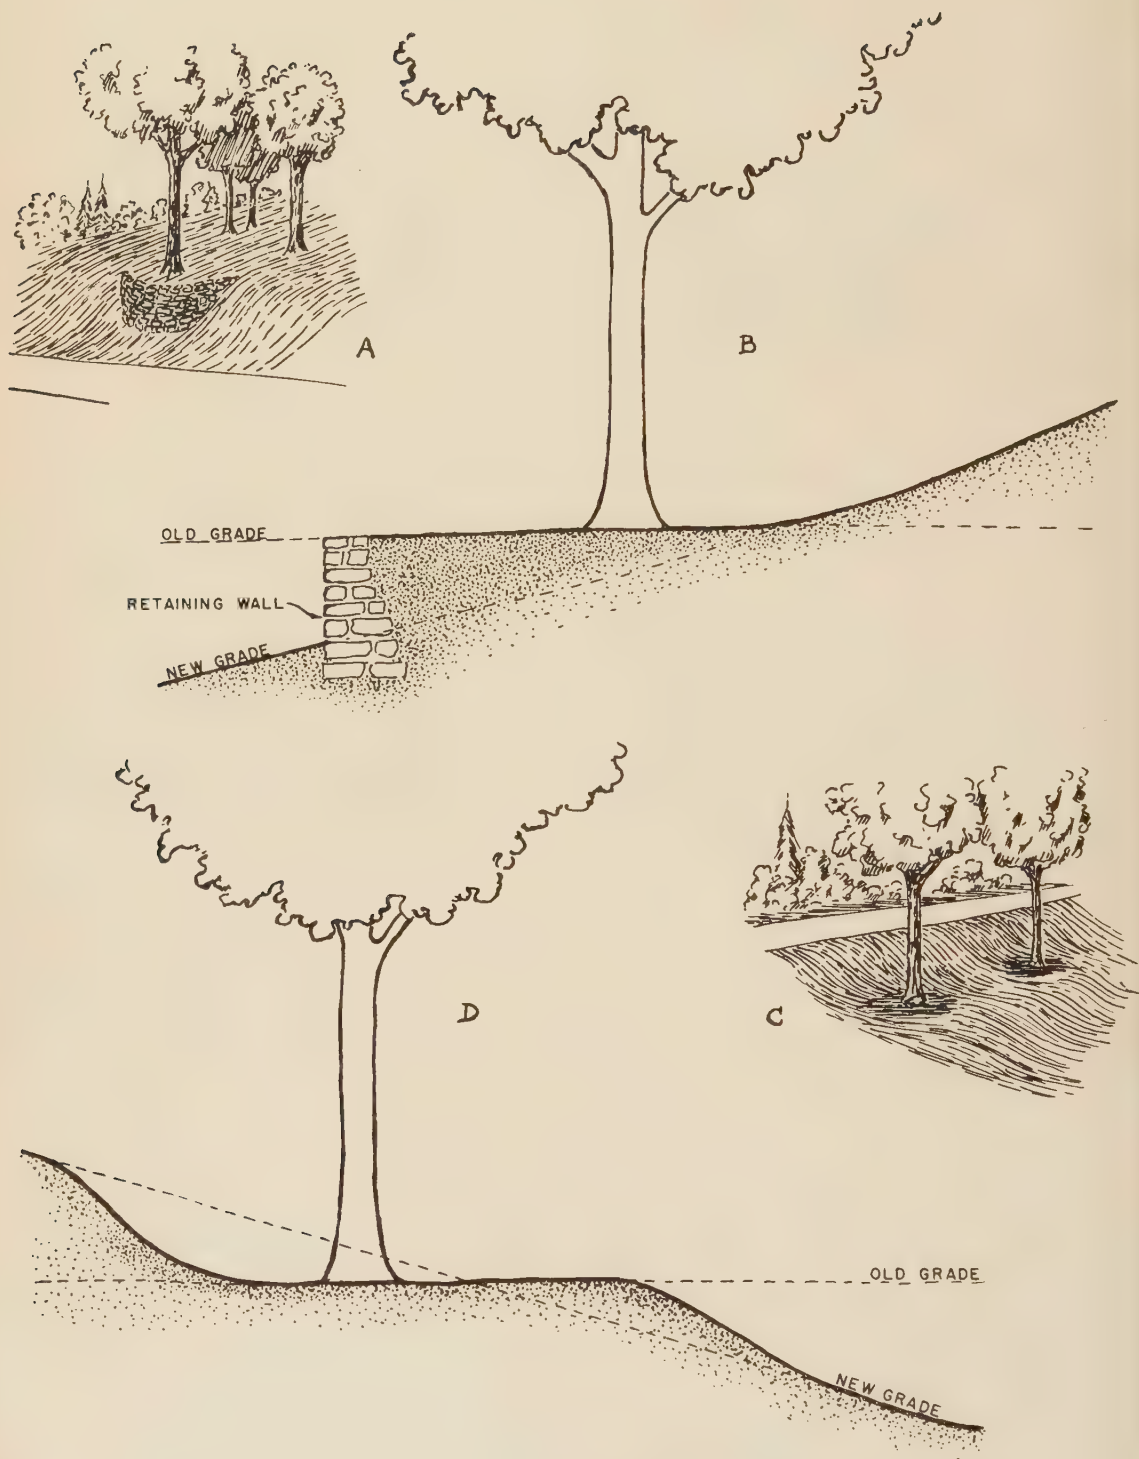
A, masonry retaining wall erected. B, cross section of modified aeration system showing use of retaining wall. C, molding of slopes. D, cross section of modified aeration system showing molding of slopes.
